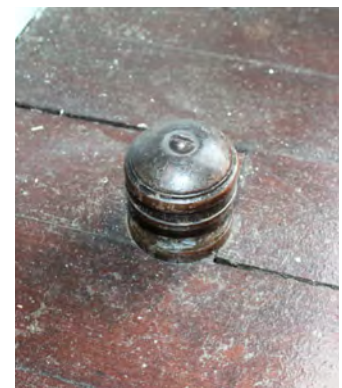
Resinous finished floor mounted wood door stop. (HA, 2015)
